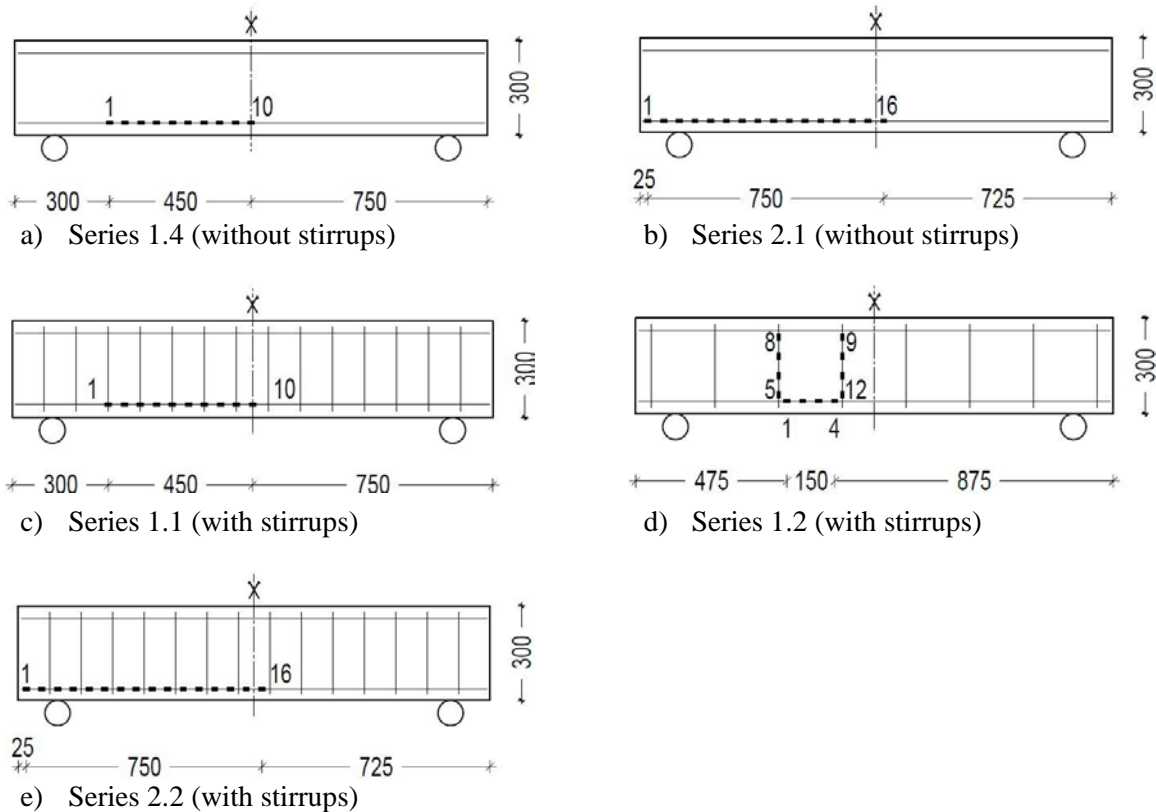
Geometry, reinforcement, and strain measurement positions for beams. (Leicht et al. (2021))
